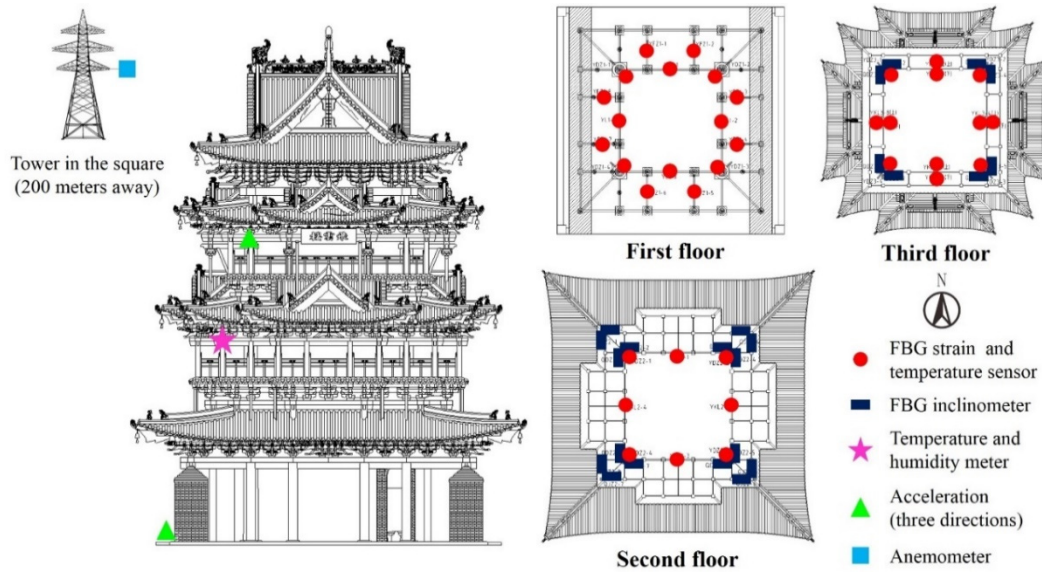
Sensor layout on the Feiyun Wooden Pavilion
